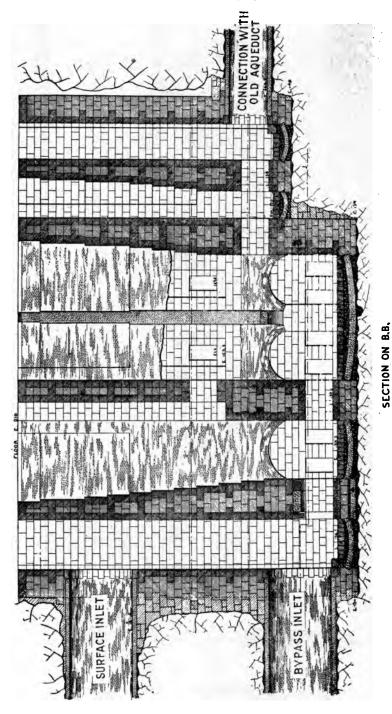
Inlet Gate-house of New Croton Aqueduct.
